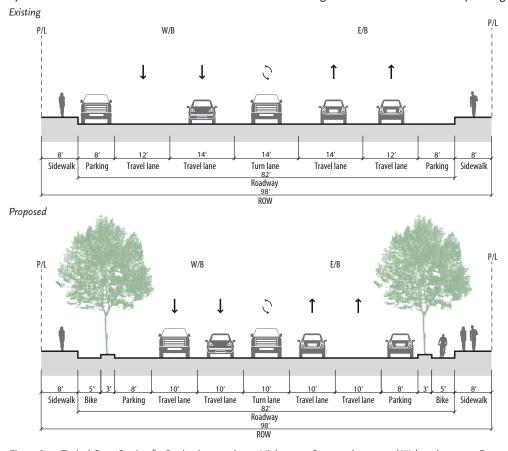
Typical Cross-Section for Bonita Avenue, Arrow Highway to Cataract Avenue and Walnut Avenue to East City Limit
